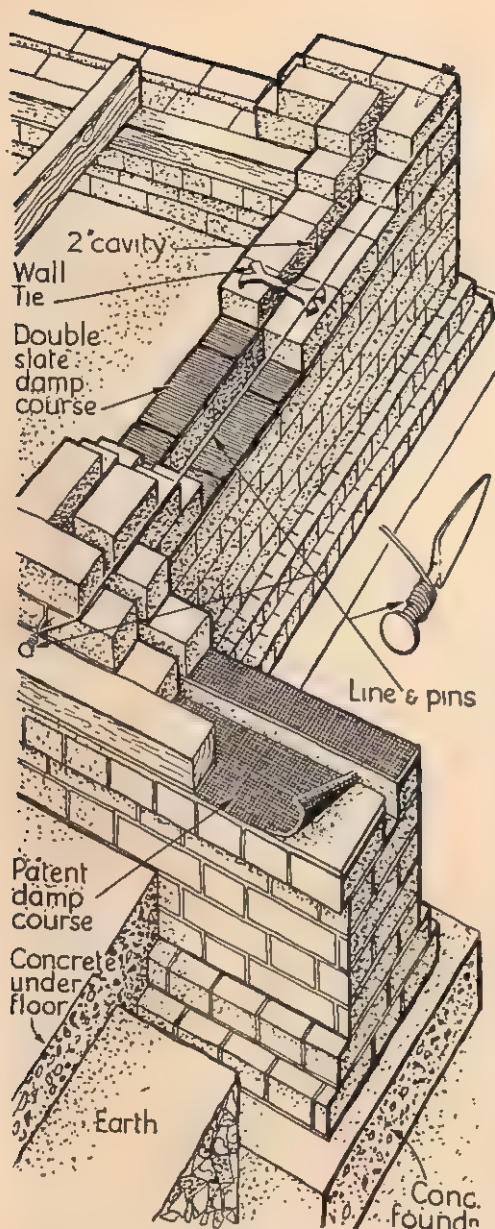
The cavity wall is built on the wall footings. Two kinds of damp-course are shown—slates, and lead foil between damp-proof felt. Notice also the iron ties and the way in which the line and pins are used.
